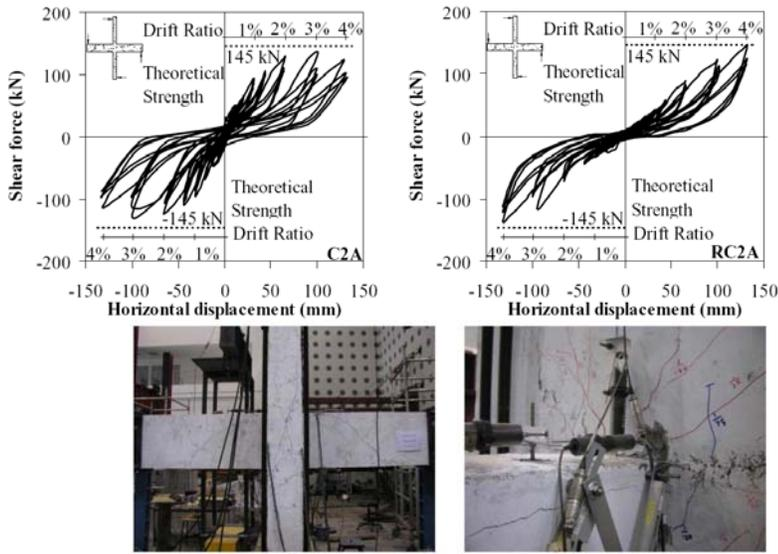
Typical cracking patterns of Specimen C2 at DR of 4%
